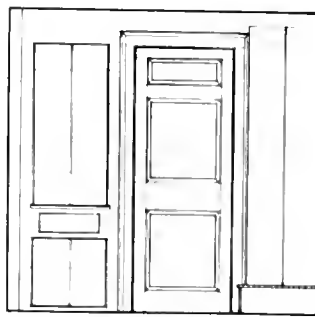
Upstairs East Hall, South Elevation. The door leads into Bathroom #2. The cabinets are built-in with a drawer. The stair to the attic is on the right (drawings adapted from 1946 photo)
